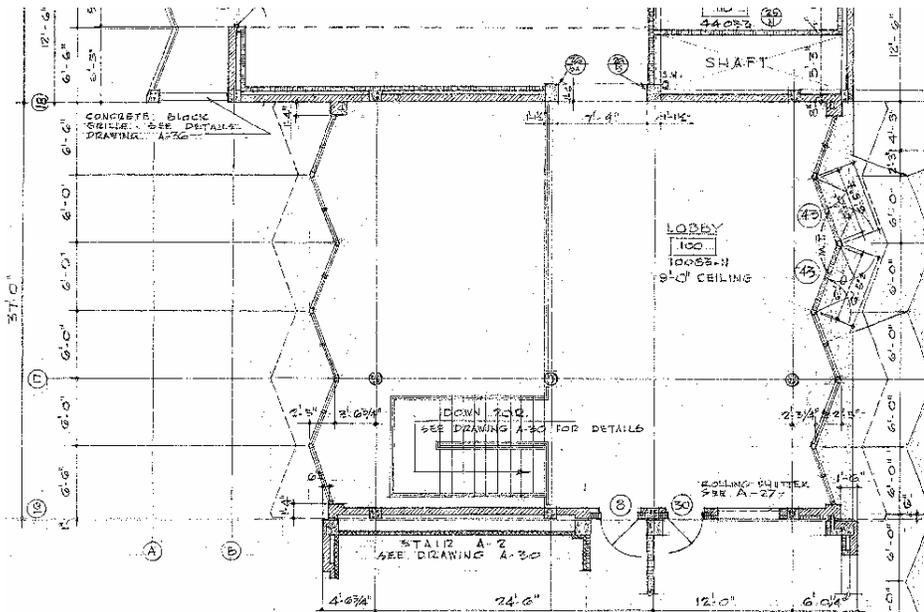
Original Construction Document, First Floor Lobby Space [9]
